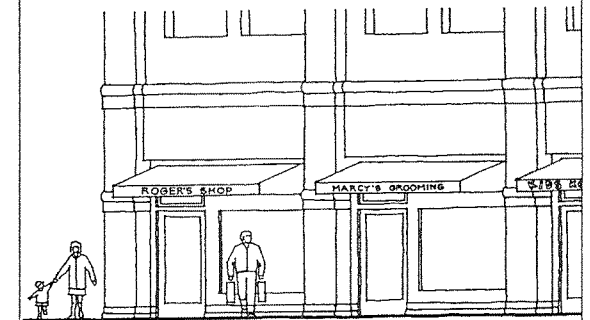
, Building Face Signs. Building Face signage shall be integrated and respond to the architectural features of the building while being easily viewed by passing autos.
